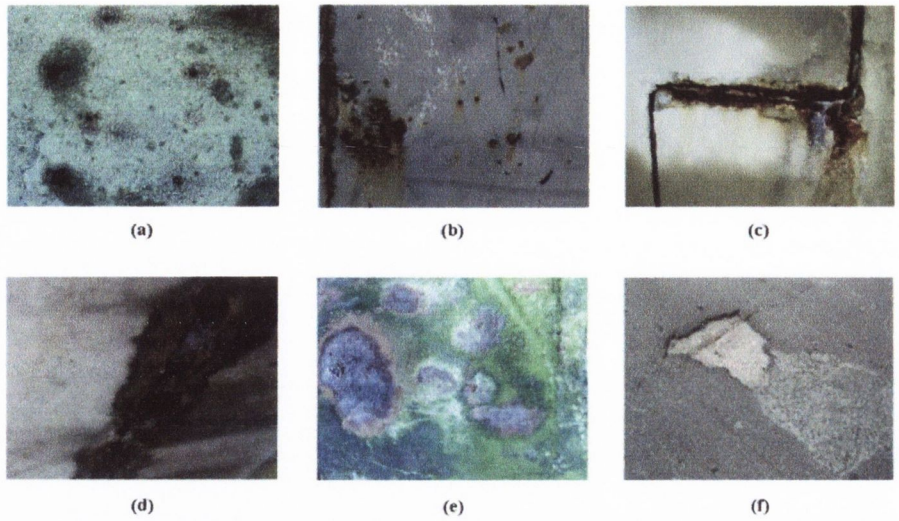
Sample images in the RGB colour space: (a) pitting corrosion on metal sheet piling, (b) corroded metal, (c) corrosion at a half joint, (d) staining through bridge deck, (e) marine growth on steel surface, (f) exposed bridge deck.
